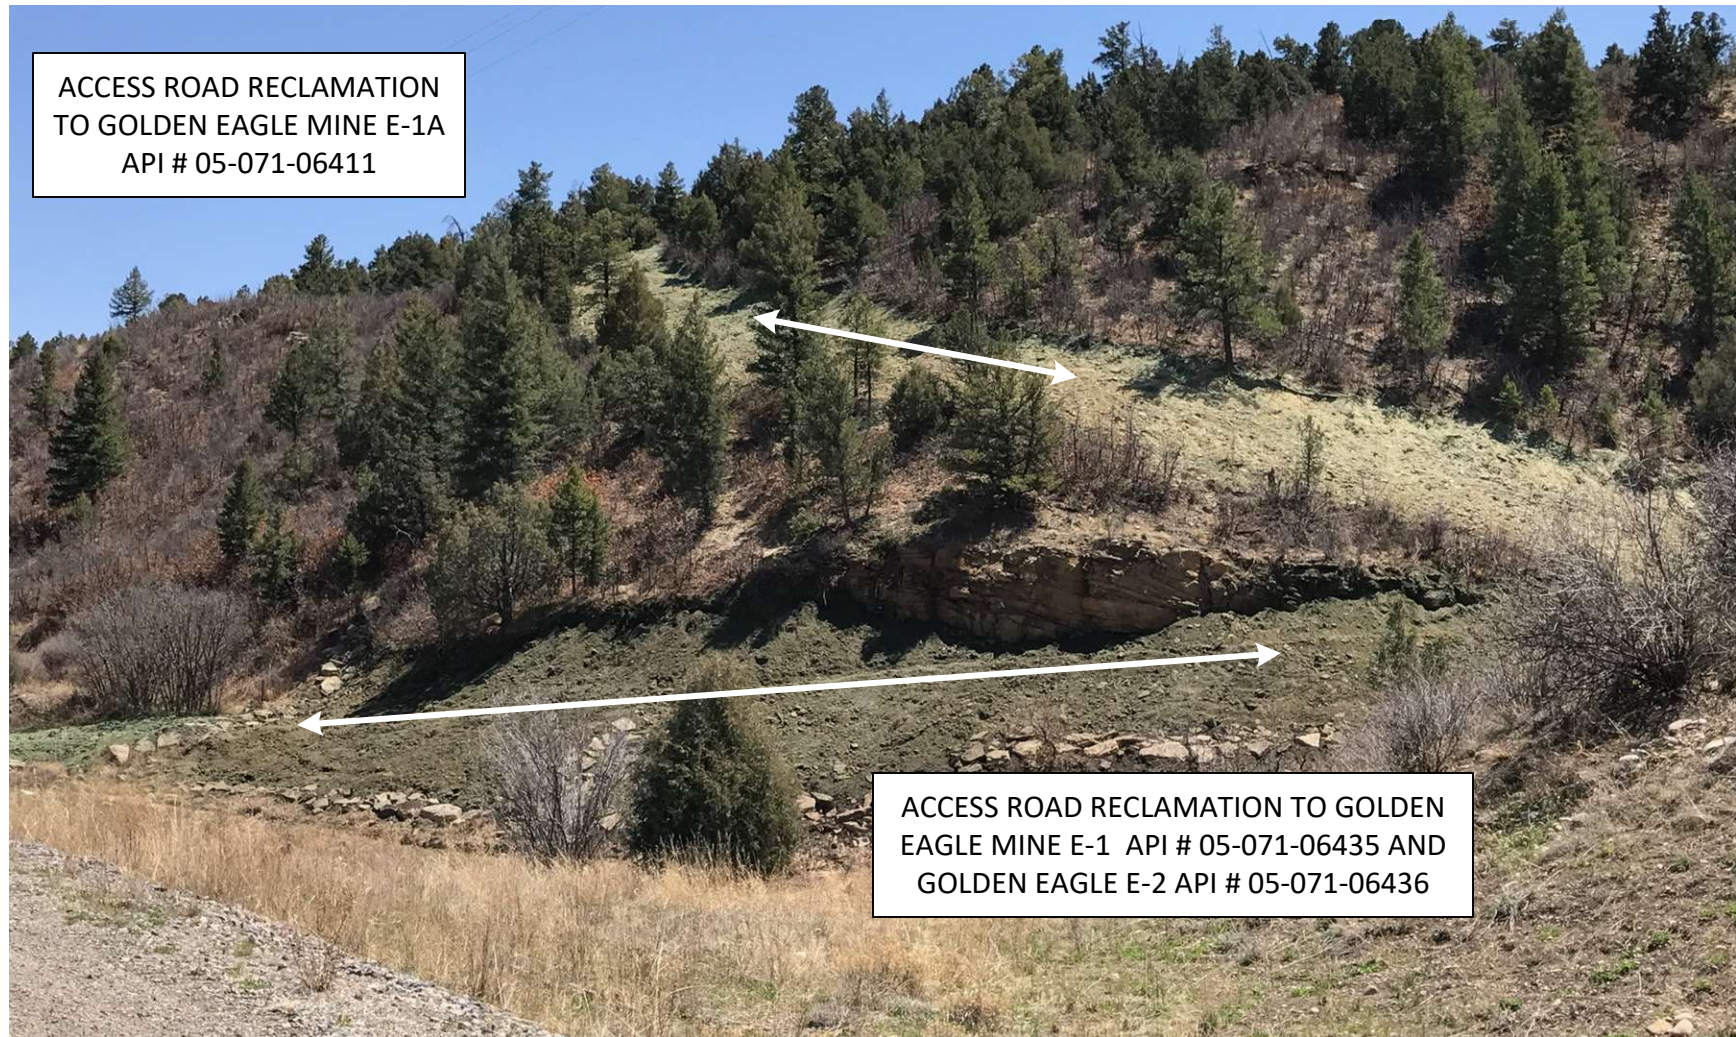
FACING SOUTHEAST AT THE GOLDEN EAGLE MINE E-1, E-2 AND E-1A ACCESS ROAD RECLAMATION FROM THE RAIL ROAD ROW. THE ACCESS ROAD WAS RECONTOURED TO MATCH THE SURROUNDING TERRAIN. GRADING TECHNIQUES WERE INSTALLED ON THE CONTOUR. ARMOR WAS INSTALLED IN AREAS OF CONCENTRATED FLOW FOR EROSION CONTROL AND PERMANENT STABILIZATION. THE EARTH DISTURBANCE WAS HYDRO-SEEDED WITH AN APPROVED COLORADO PARKS AND WILDLIFE (CPW) SEED MIX TO PROMOTE THE ESTABLISHMENT OF VEGETATION.
